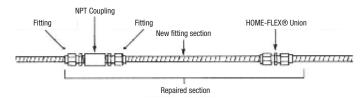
Repair of Damaged Tubing with a Spliced New Section
